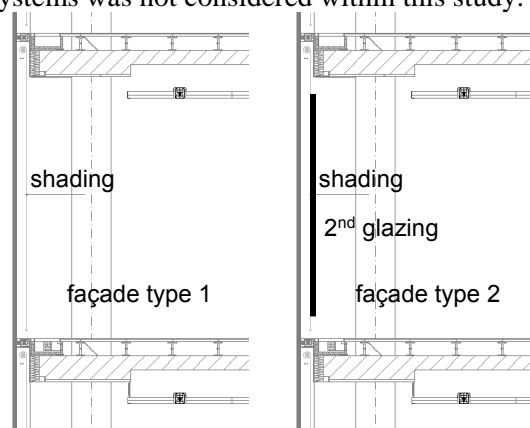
Façade type 1 (left side): single skin façade with internal shading element / façade type 2 (right side): single storey double skin façade with a shading element between the glazing elements.
